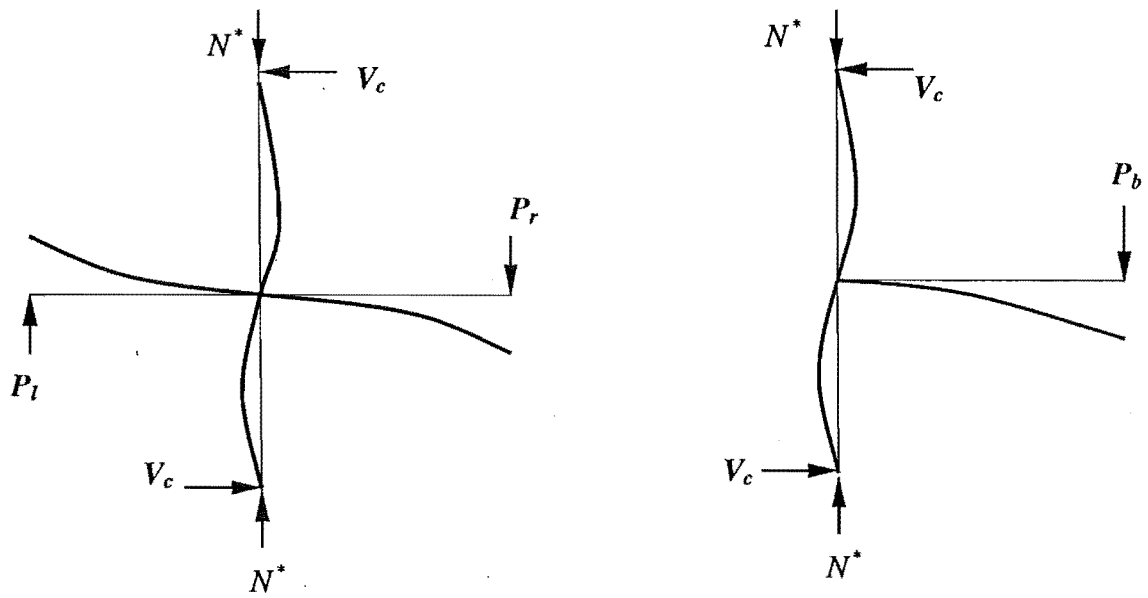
Method of Loading Exterior Beam-Column Joints
